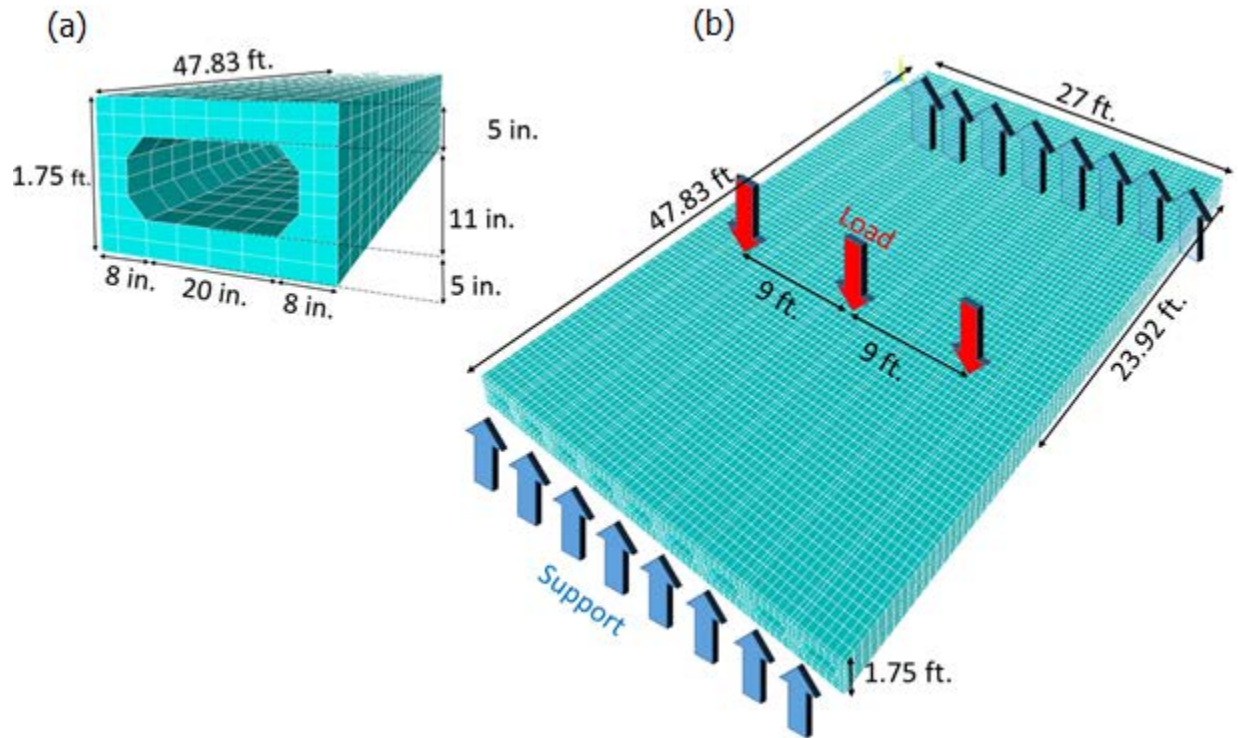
Phase II (a) Beam Cross-section - (b) Bridge Geometry
